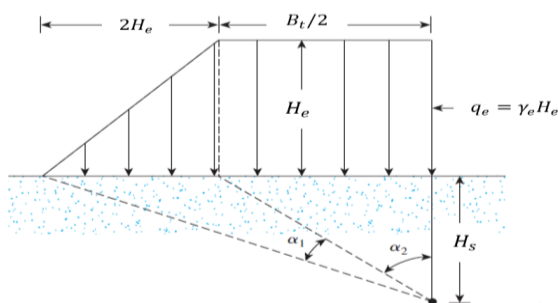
Stress Reduction Due to Embankment loading considering 1V:2H Side slope [3]
